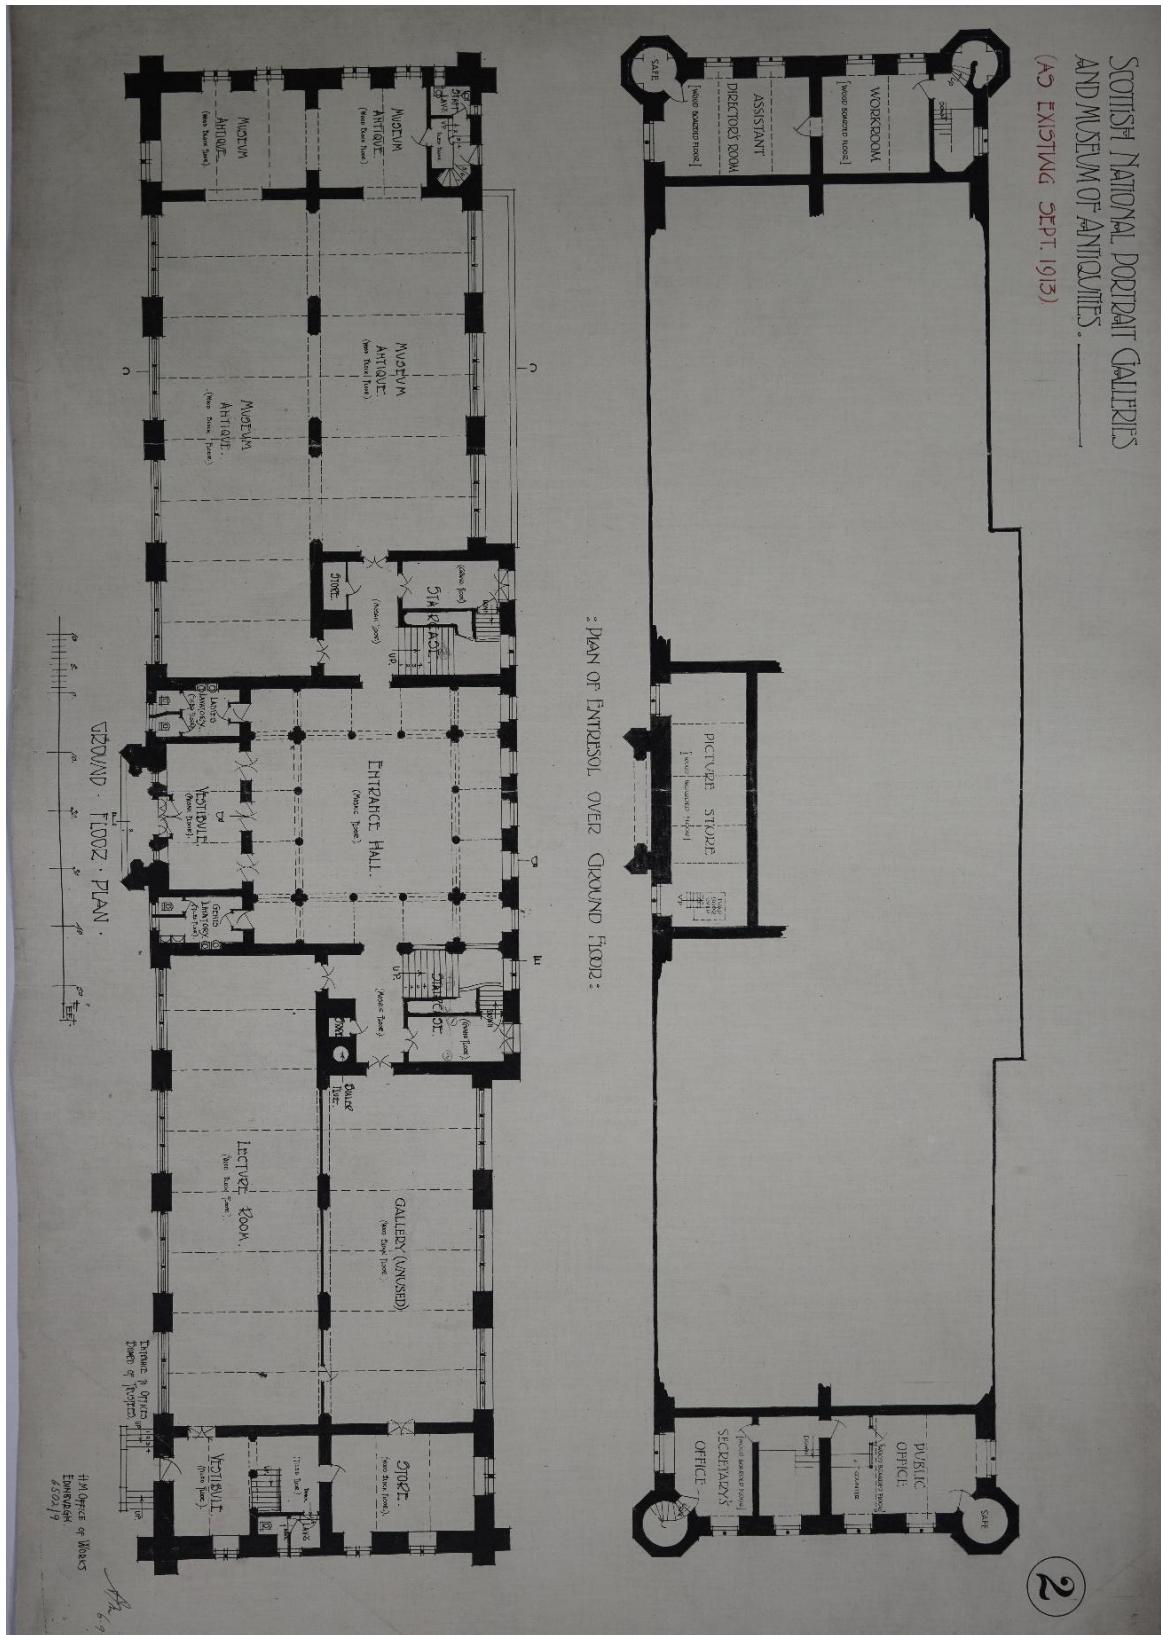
Ground floor plan, Queen Street, 1913, NRS, RHP6502/9.
